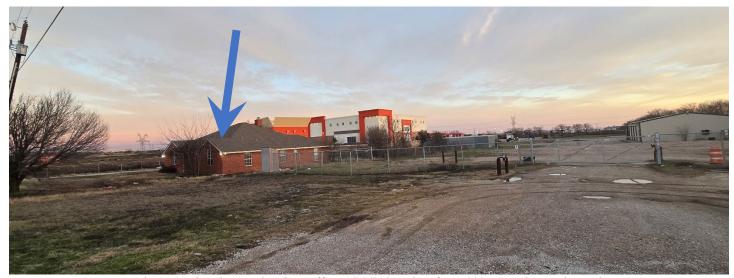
Site Photos taken by staff on 1/30/2025; view from 644 E Bonds Ranch Road
